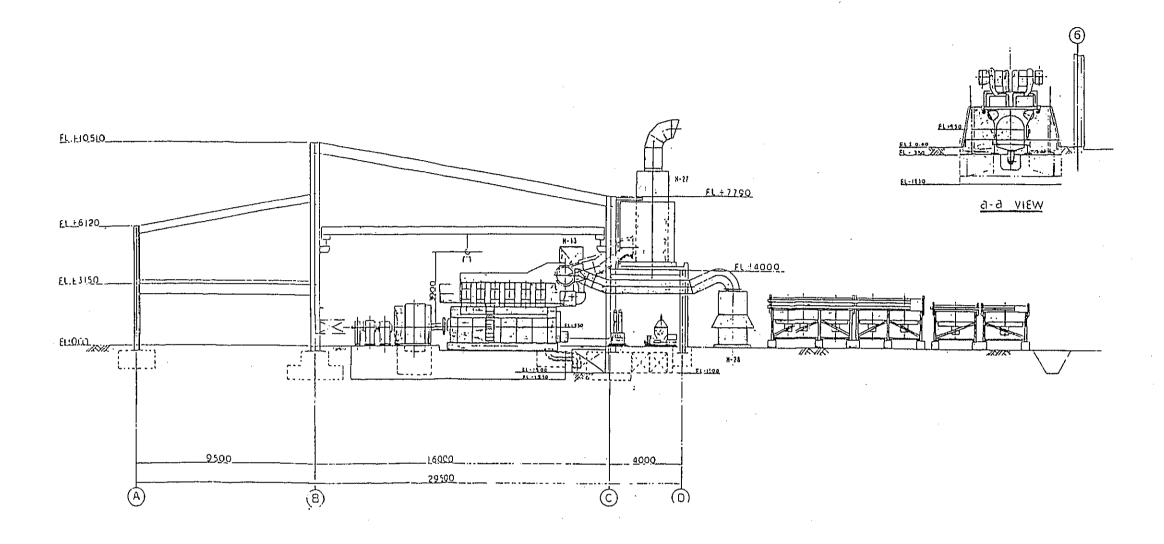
Plot Plan of No. 4 DEG (Side view)
